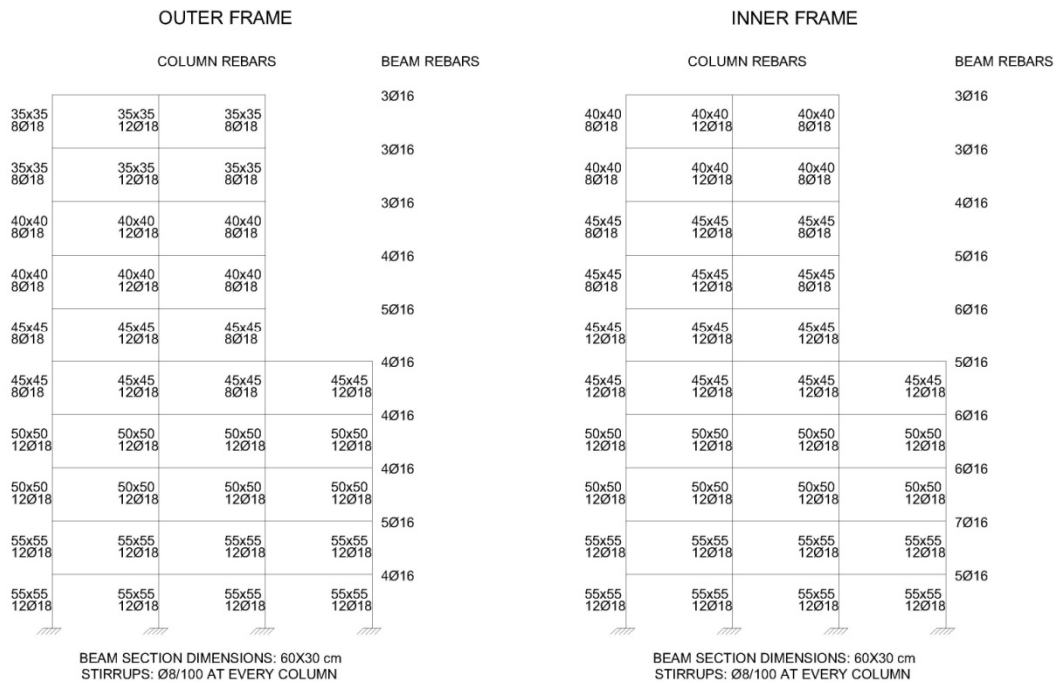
Section dimensions and detailing of the Ten-Storey Frame A.
